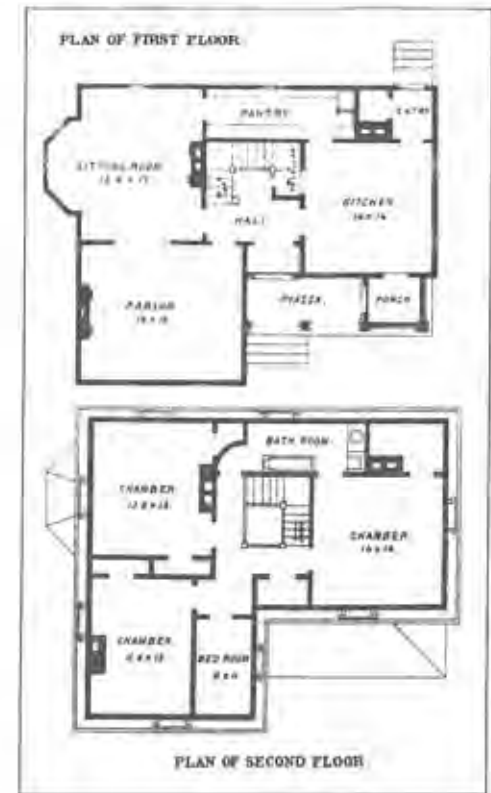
House Plan, Bicknell's Victorian Buildings (1878)
